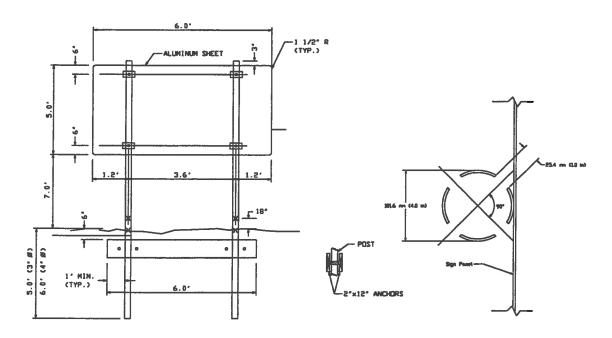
Elevation View of the Dual Thin-Walled Aluminum Support Sign Installation.
